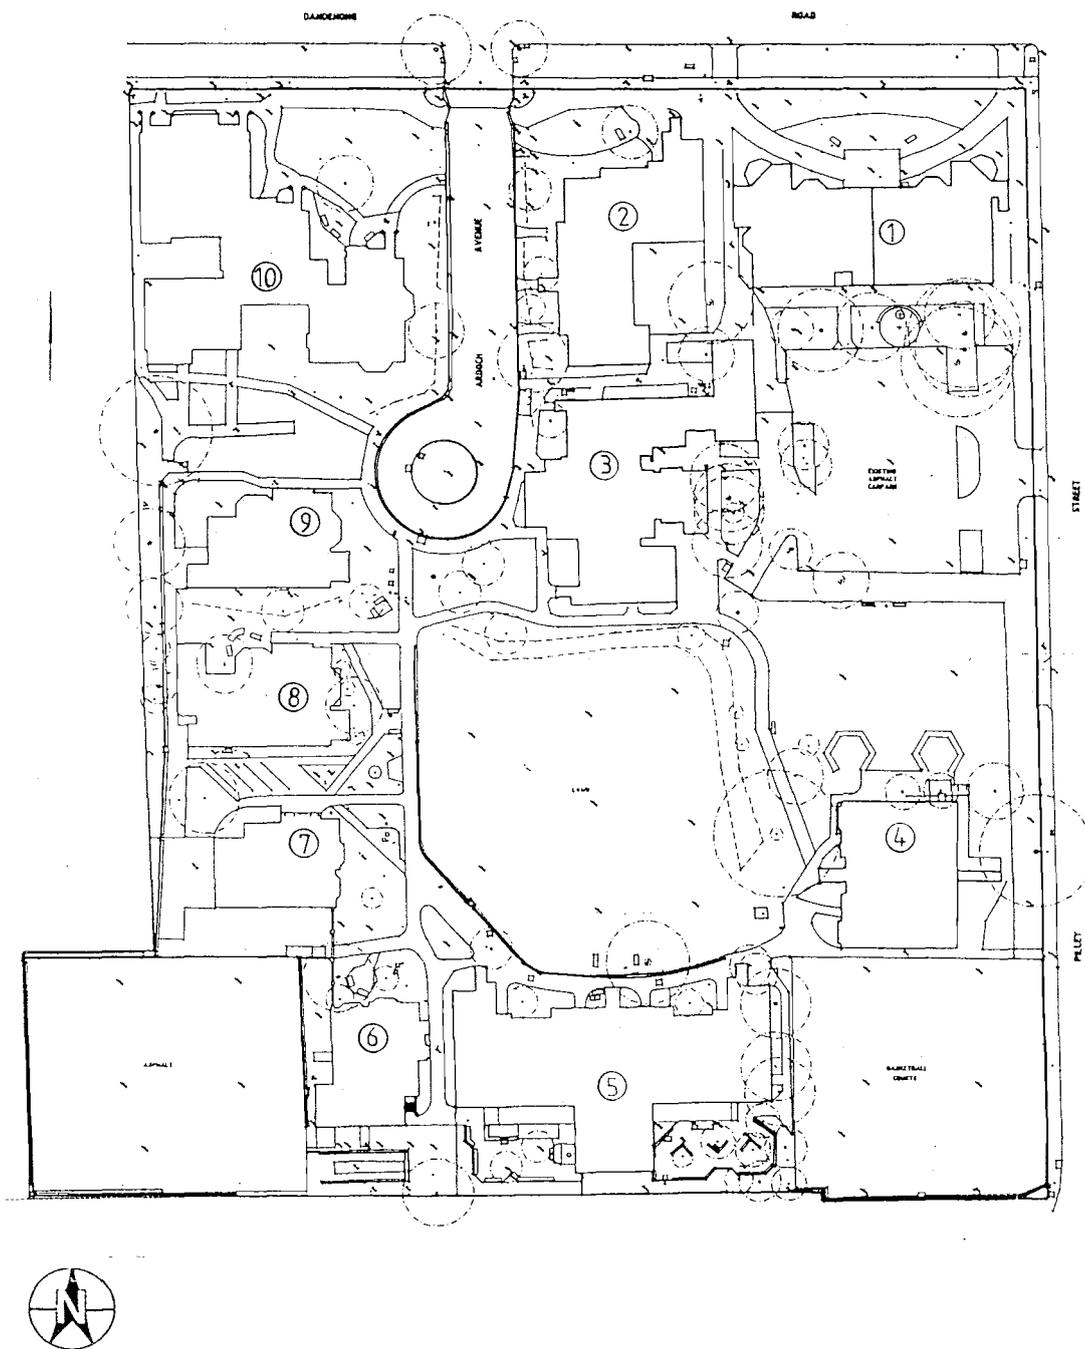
Building location plan and existing conditions survey. Reproduced from Meldrum Burrows and Partners, Ardoch Village Outline Development Plan.
